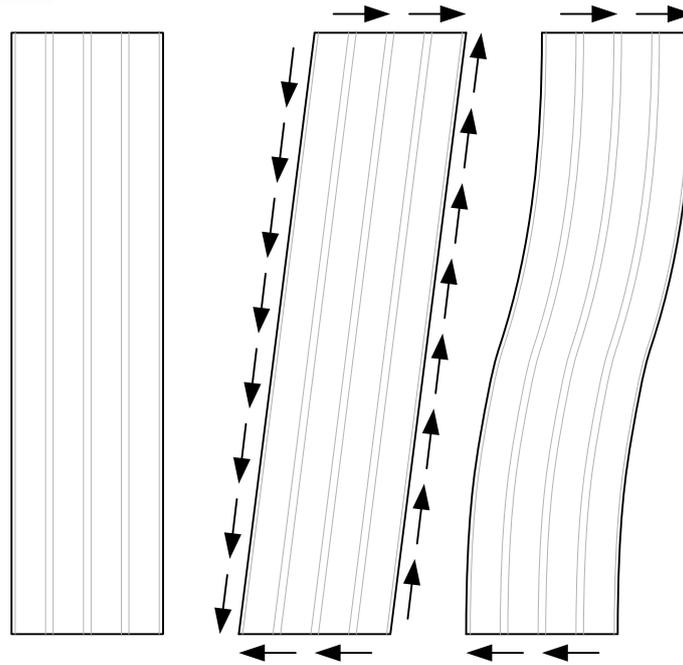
Load bearing systems: shear diaphragm and Vierendeel girder
